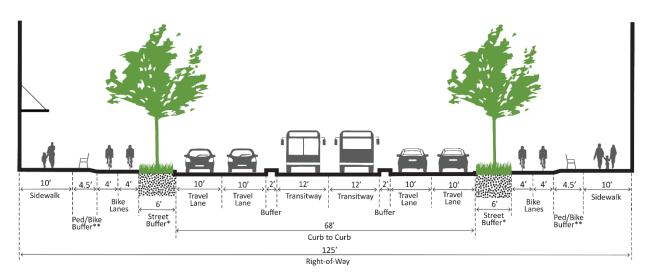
Colesville Road (M-10): Spring Street to Fenton Street, Looking North
